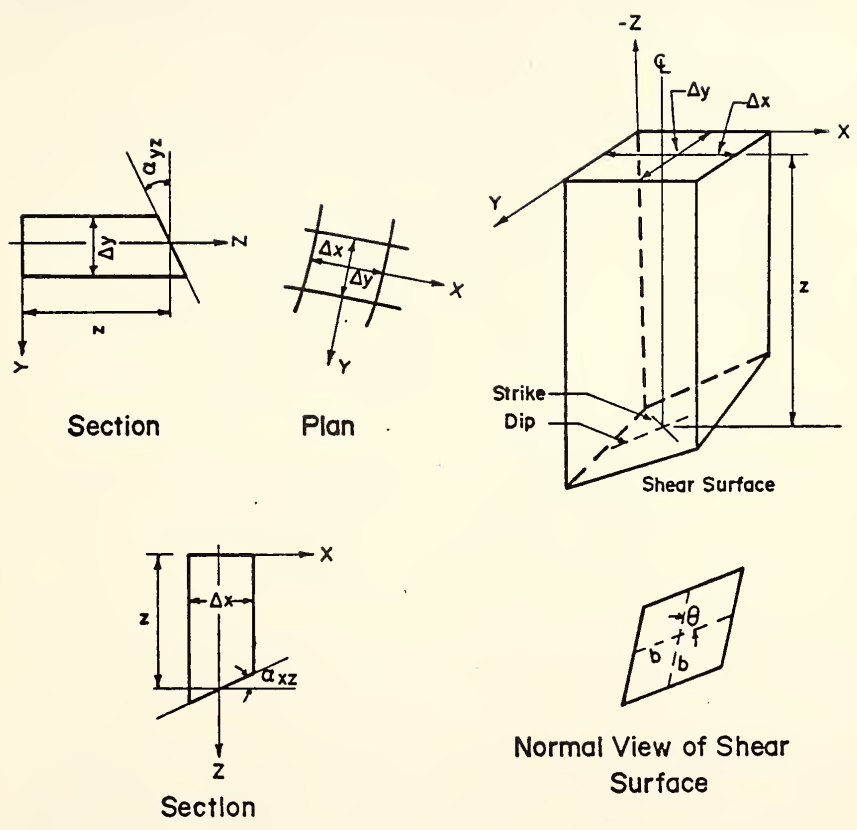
Plan, Section, and Three-Dimensional Views of One Soil Column
